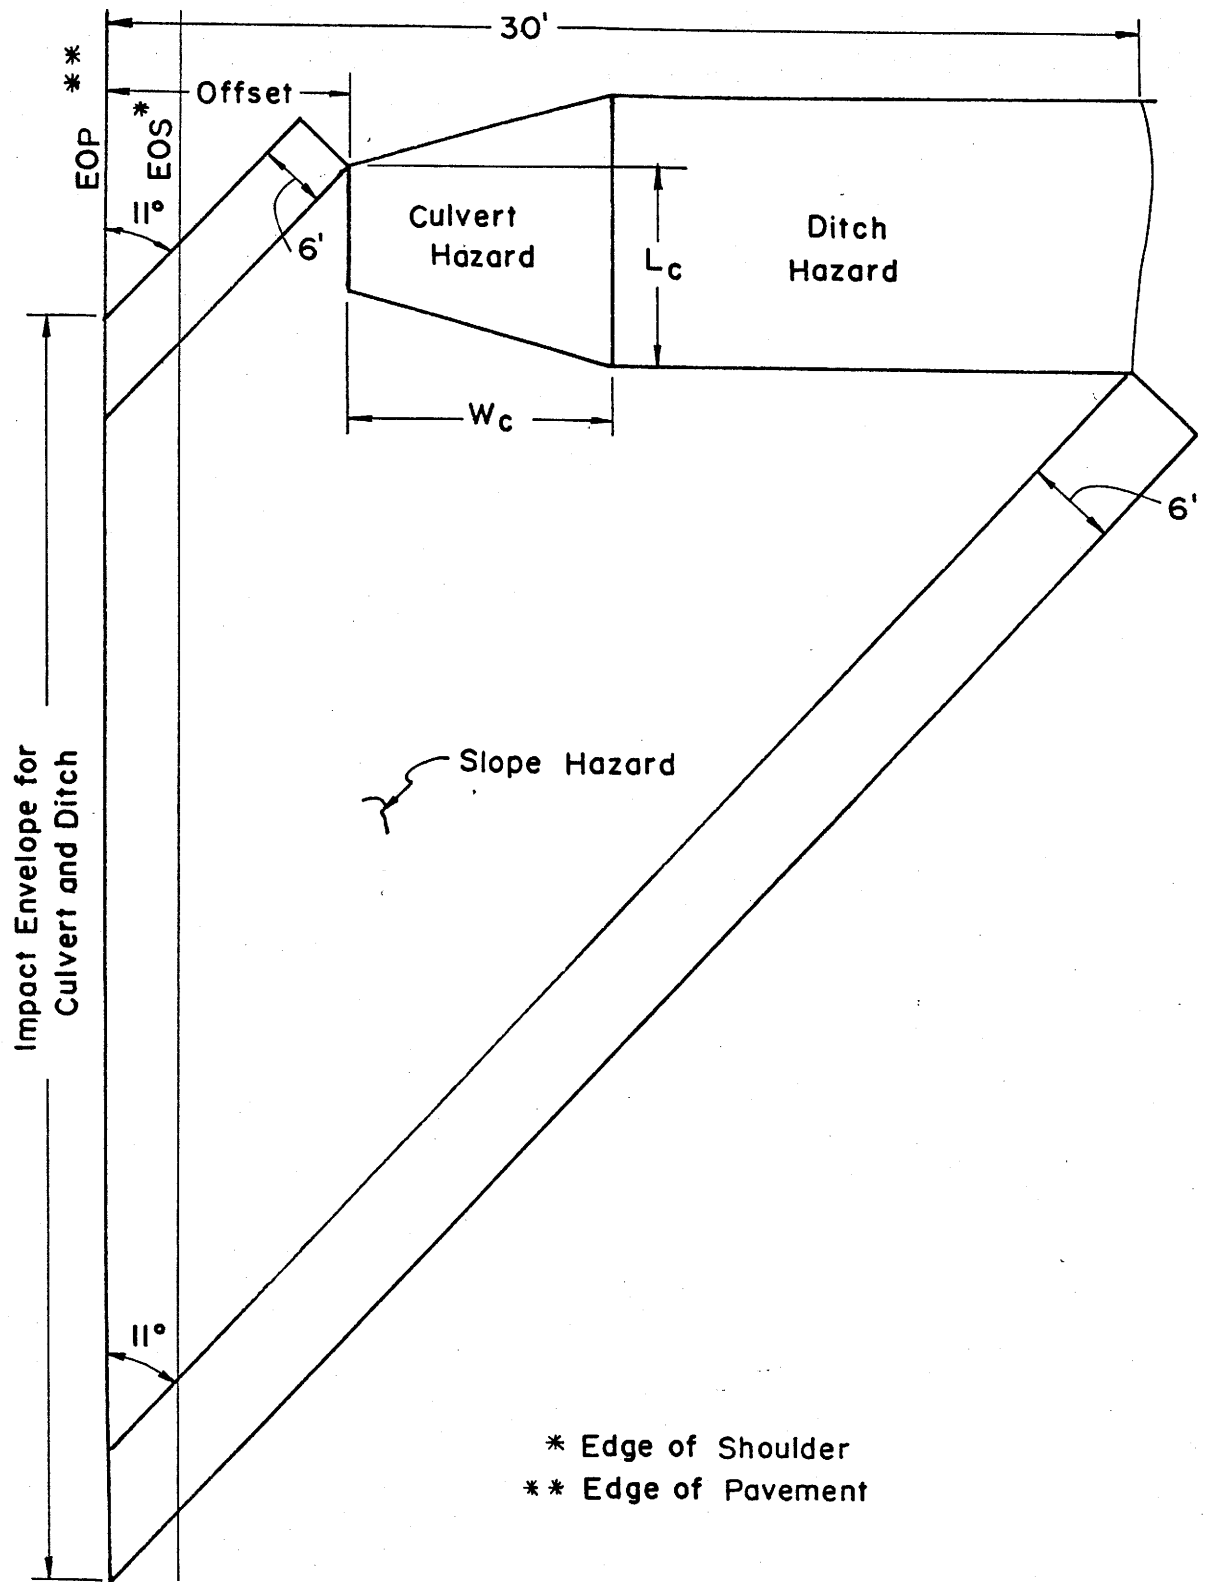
HAZARD ENVELOPE FOR AN UNPROTECTED CULVERT AND DITCH
